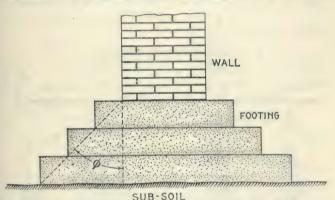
Angle for foundation footing. In ordinary practice the footing courses upon which the walls of the building proper rest, consist of blocks or slabs of stone as large as are available and convenient to handle. Footings of brick or concrete are also used in very soft soils; footings consisting of timber grillage are often employed. A grillage of iron or steel beams has also been used successfully. The inclination of the angle φ, of footing should be about as follows: for metal footings 75°; for stone, 60°; for concrete, 45°; for brick, 30°. Damp proof courses of slate, or layer of asphalt are laid in or on the foundations or lower walls to prevent moisture arising or penetrating by capillary attraction.
